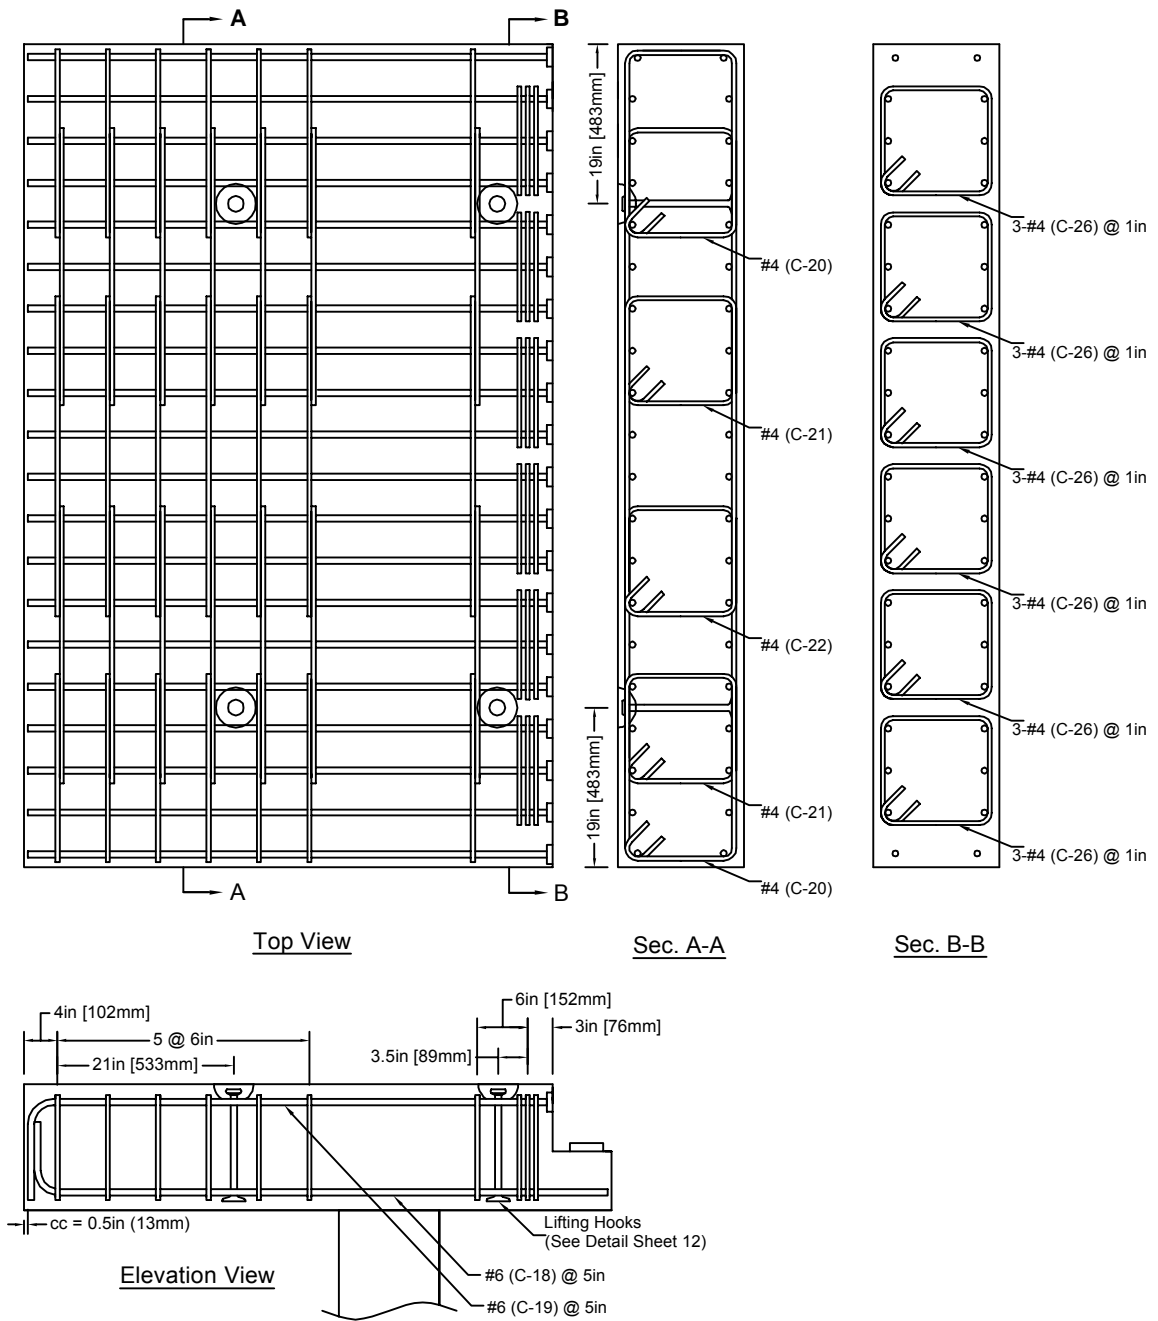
Bridge Plans Sheet 7; Bent 1&3 Cantilever Reinforcement.
